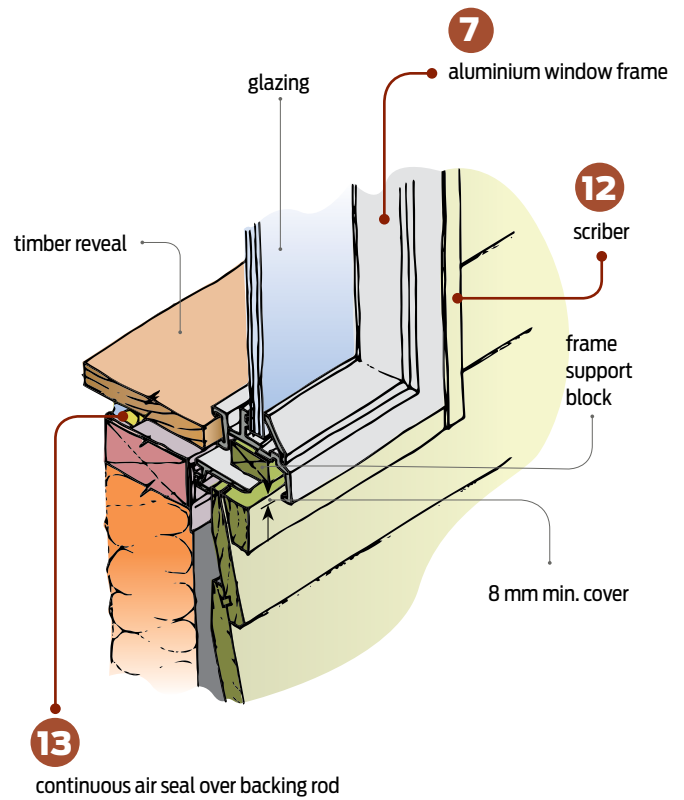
Steps 7, 12 and 13: Install window and finish sill.
